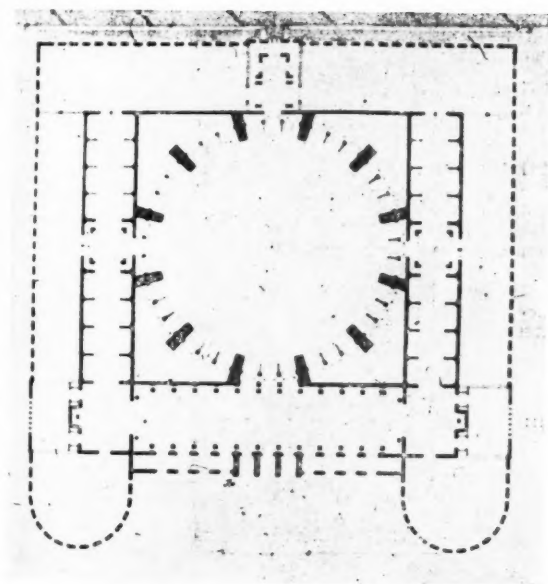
PLAN OF "NEBO'S" ELEVATION GIVEN ABOVE
